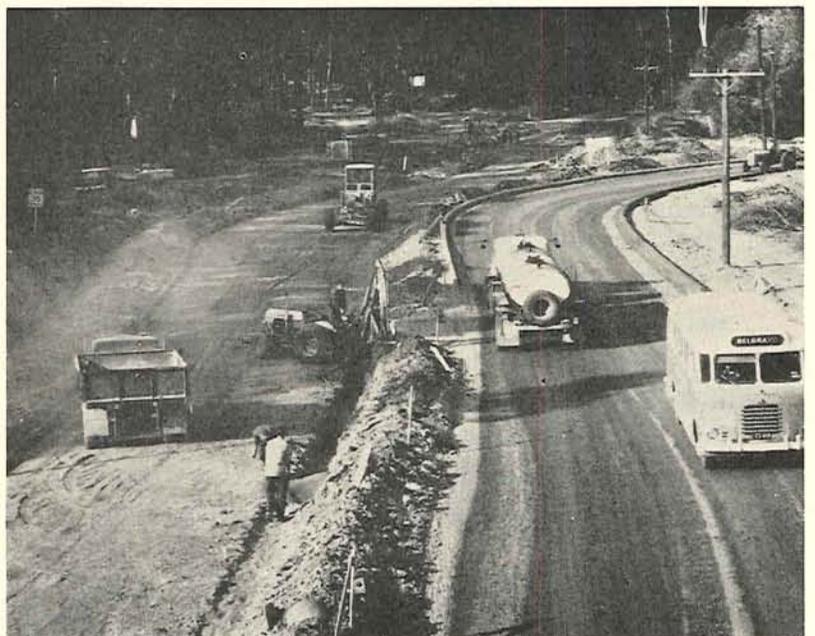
McIvor Highway—Reconstructed section at Junorton.
